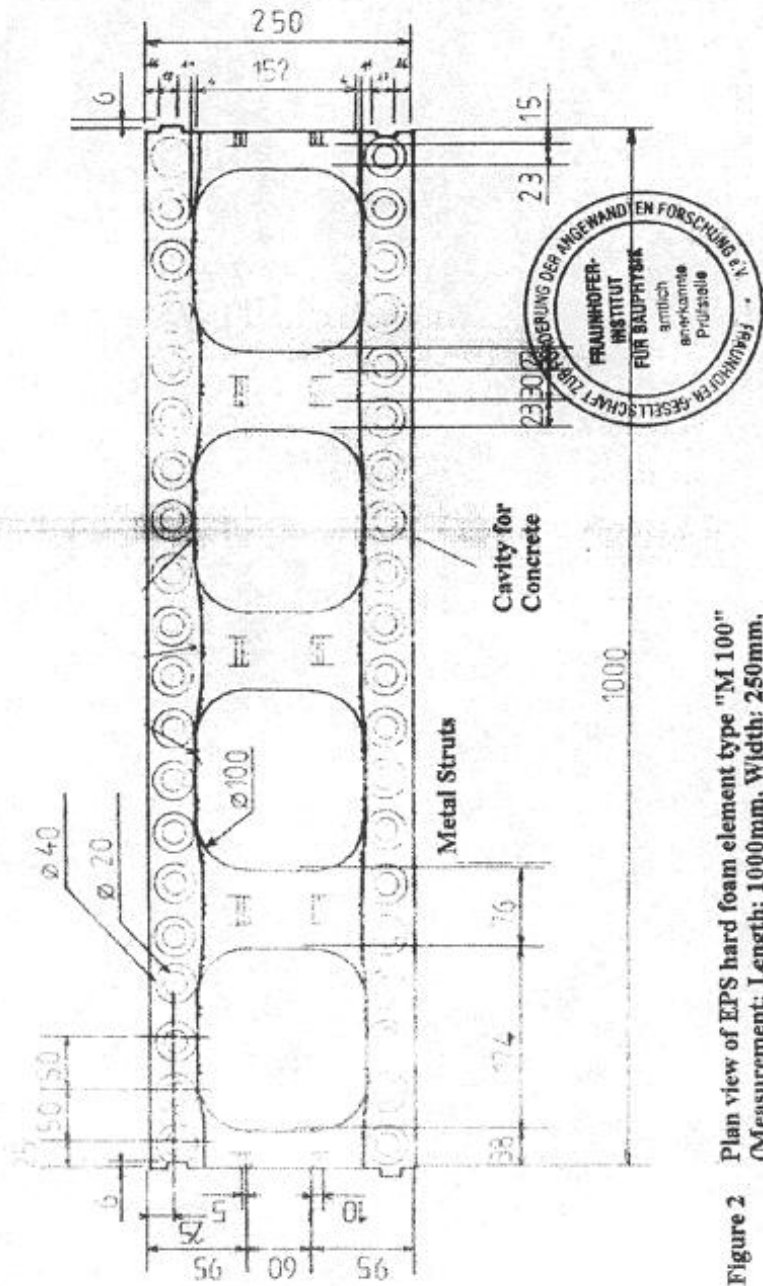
Plan view of EPS hard foam element type "M 100" (Measurement: Length: 1000mm, Width: 250mm, Height: 300mm) EUROMAC 2, S.ar.l, F-57730 Folschviller/France. Specification for layout of cavities for concrete and supporting metal struts. (Specification in mm, Applicant's drawing)
